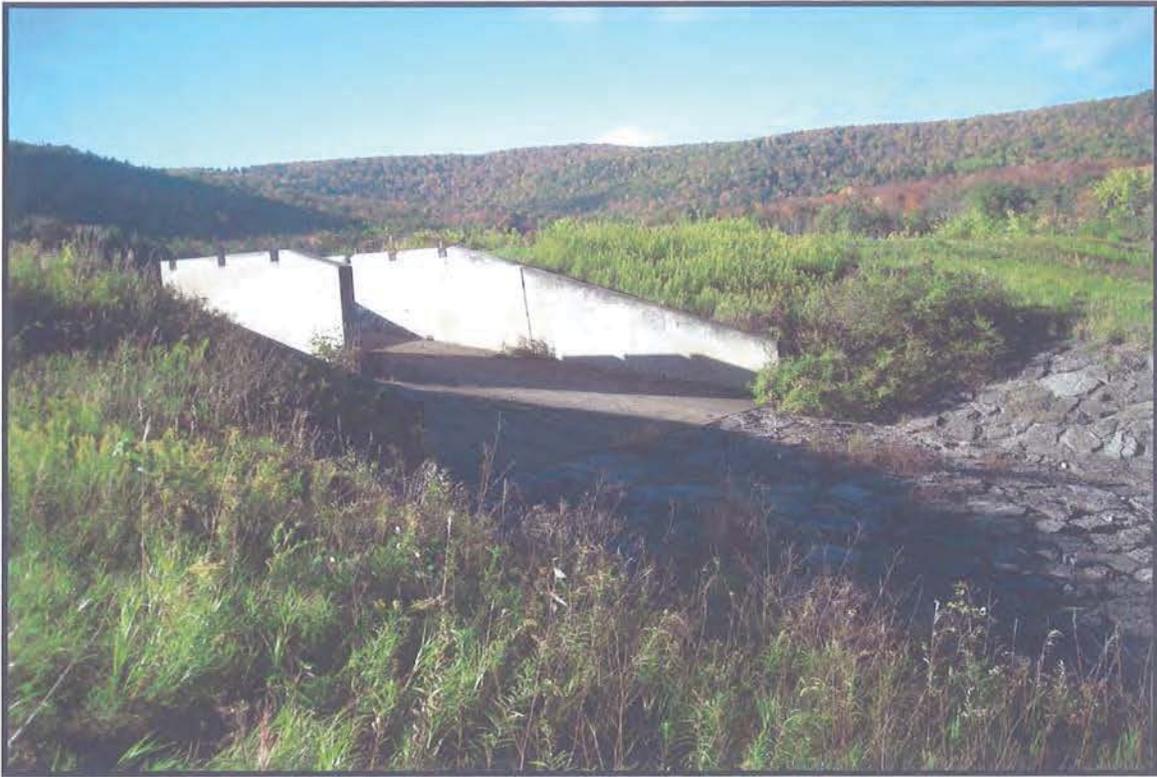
View of concrete outfall structure of the Dow Reservoir.
